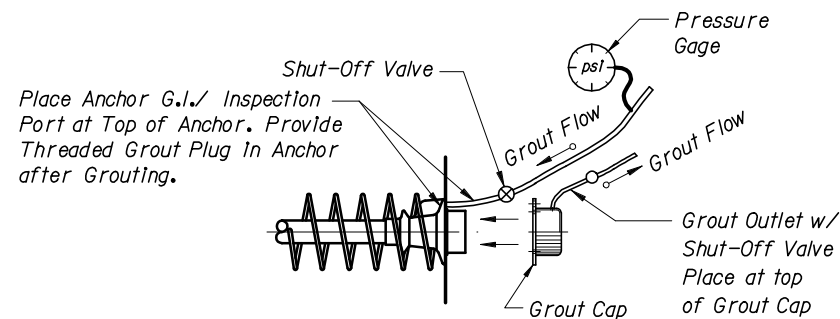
DETAIL - TRANSVERSE TENDON ANCHOR PROTECTION
